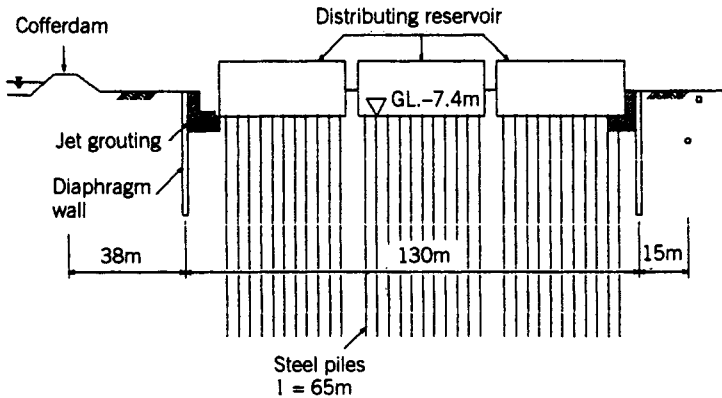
Jet grouting for construction shoring, Dallas, Texas. (From Halliburton, 1987.)
